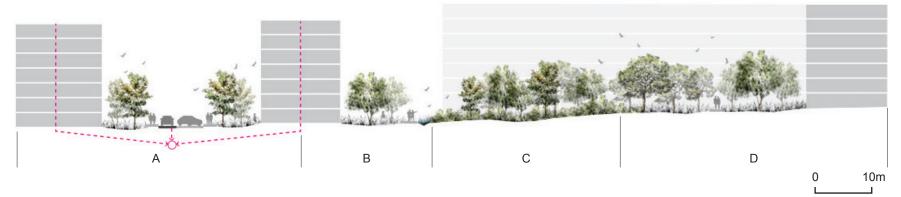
(Appendix 10.0 Page V): This section cuts through the central courtyard space between the Northern block houses. The section is cut from West to East and includes a typical road cross section (Created by author).
